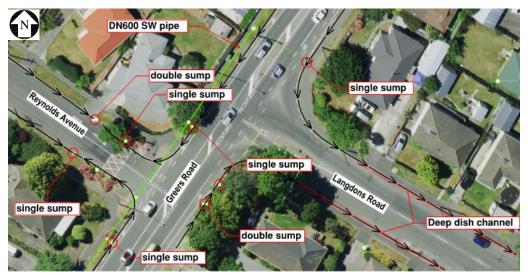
Existing stormwater infrastructure (from CCC Three Waters GIS)
